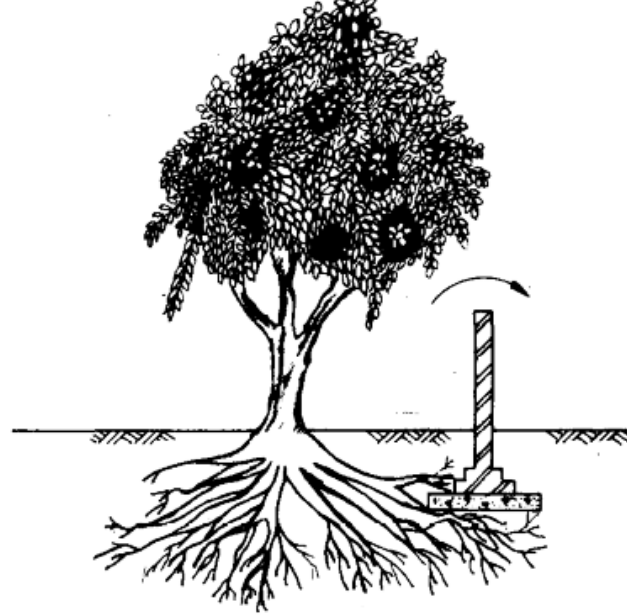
Roots of Fast Growing Tree Under the Foundation of Compound Wall may Topple Down the Wall
